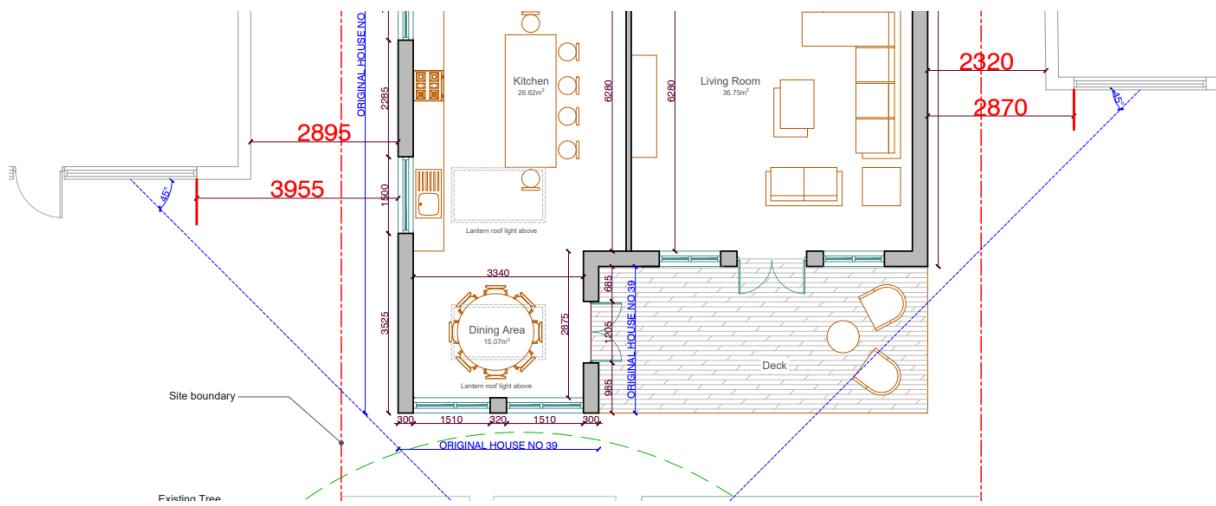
Image showing footprint of existing building (red) and the proposed building (green).
